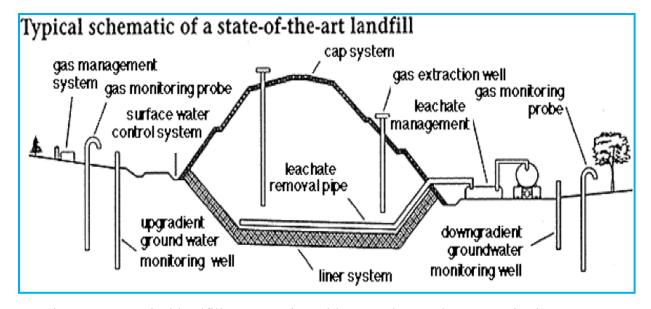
A typical landfill cross-section with gas and groundwater monitoring systems
